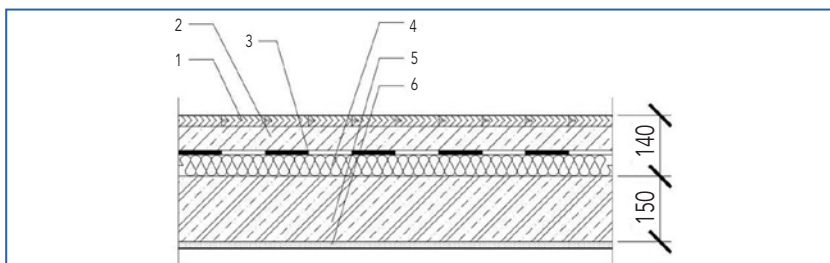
Cross-section of ceiling from reinforced concrete with floating floor on the top of it [10].
